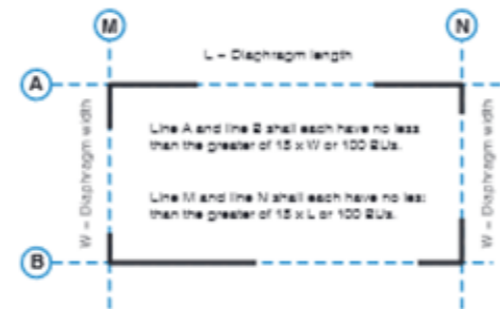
GIB® CEILING DIAPHRAGM SHEET WIDTHS AND LENGTHS
